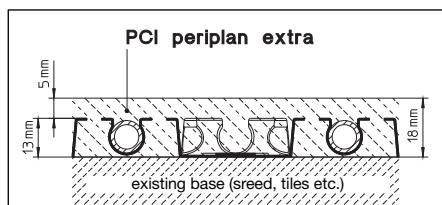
PCI periplan extra (minimum covering 5 mm, total structural height 18 mm)
